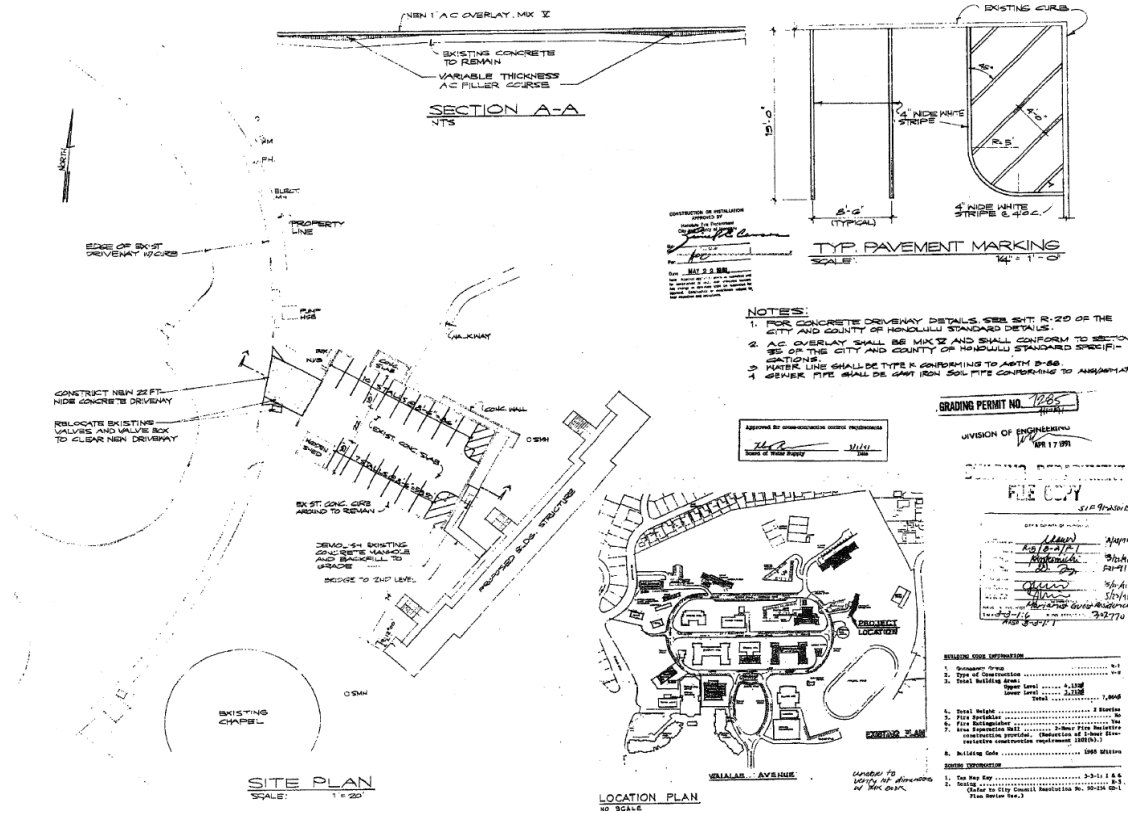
Marianist Hall, Site Plan¹⁶⁸
